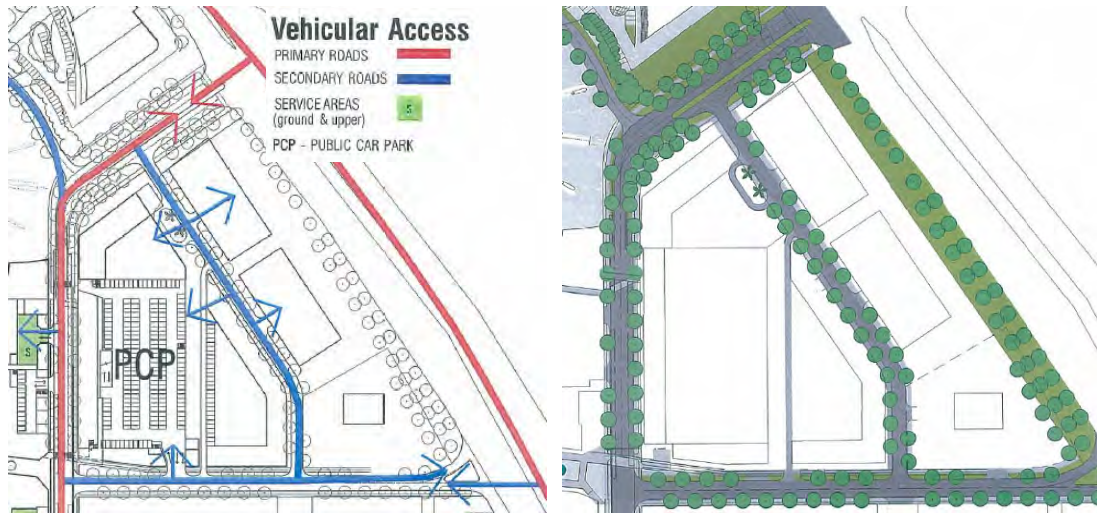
WFCDP 2003 extracts Vehicular Access (left) and Master Planning Site Plan (right)
